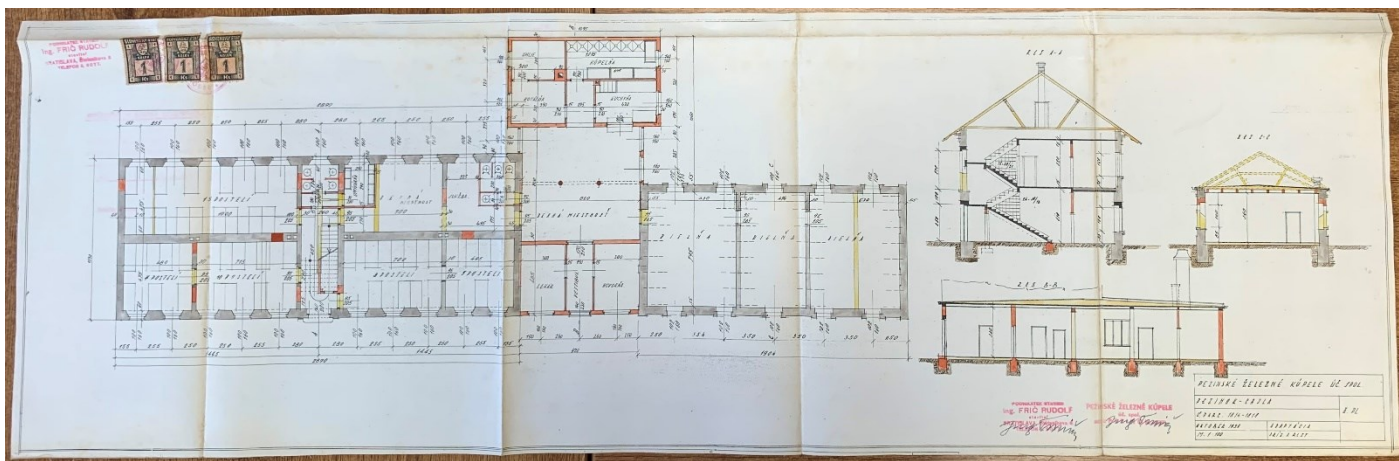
The Pezinok Institute for People with Nervous and Mental Health Disorders. Adaptation of the Antimony factory building to a women's standard ward with an added extension. Ground floor. A new women's pavilion with a chapel was built in 1941. (Source: State Archives in Bratislava, Slovakia, 1940)
